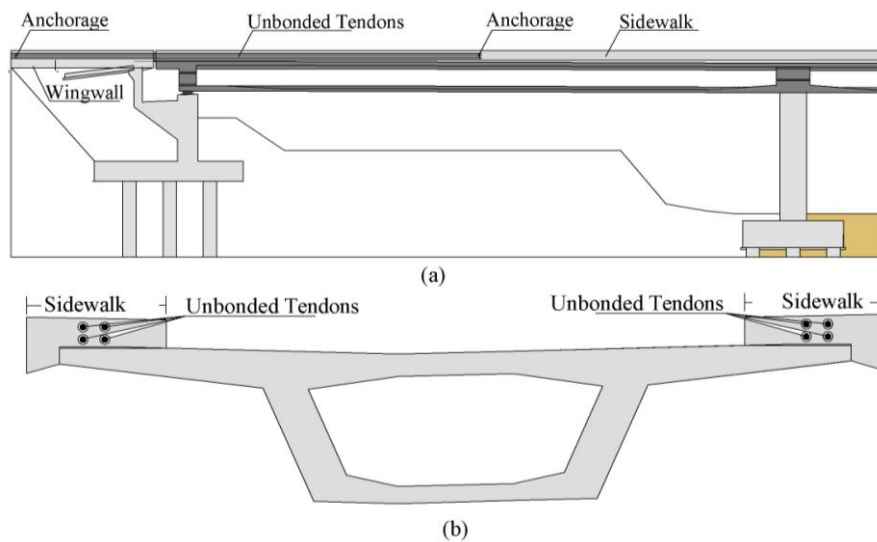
a) Indicative Longitudinal Elevation of the system, c) Indicative Deck Cross Section
